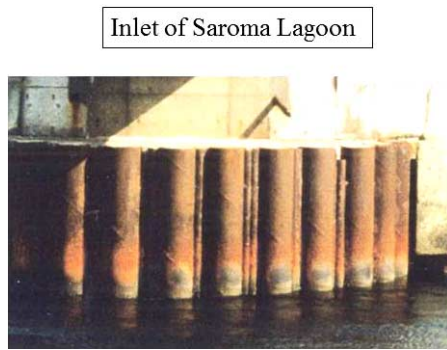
Abrasion damage to hydraulic structure in Hokkaido
